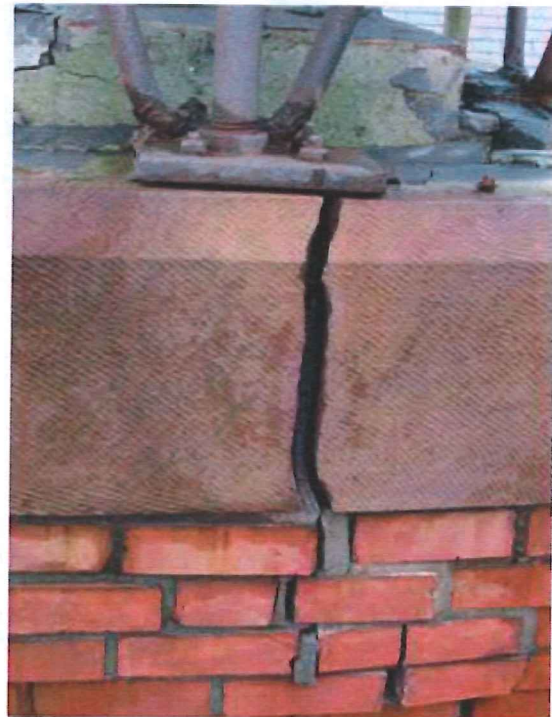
Rust Jacked Steel Plate Linels at 7 - Arch opening Brick Backup
